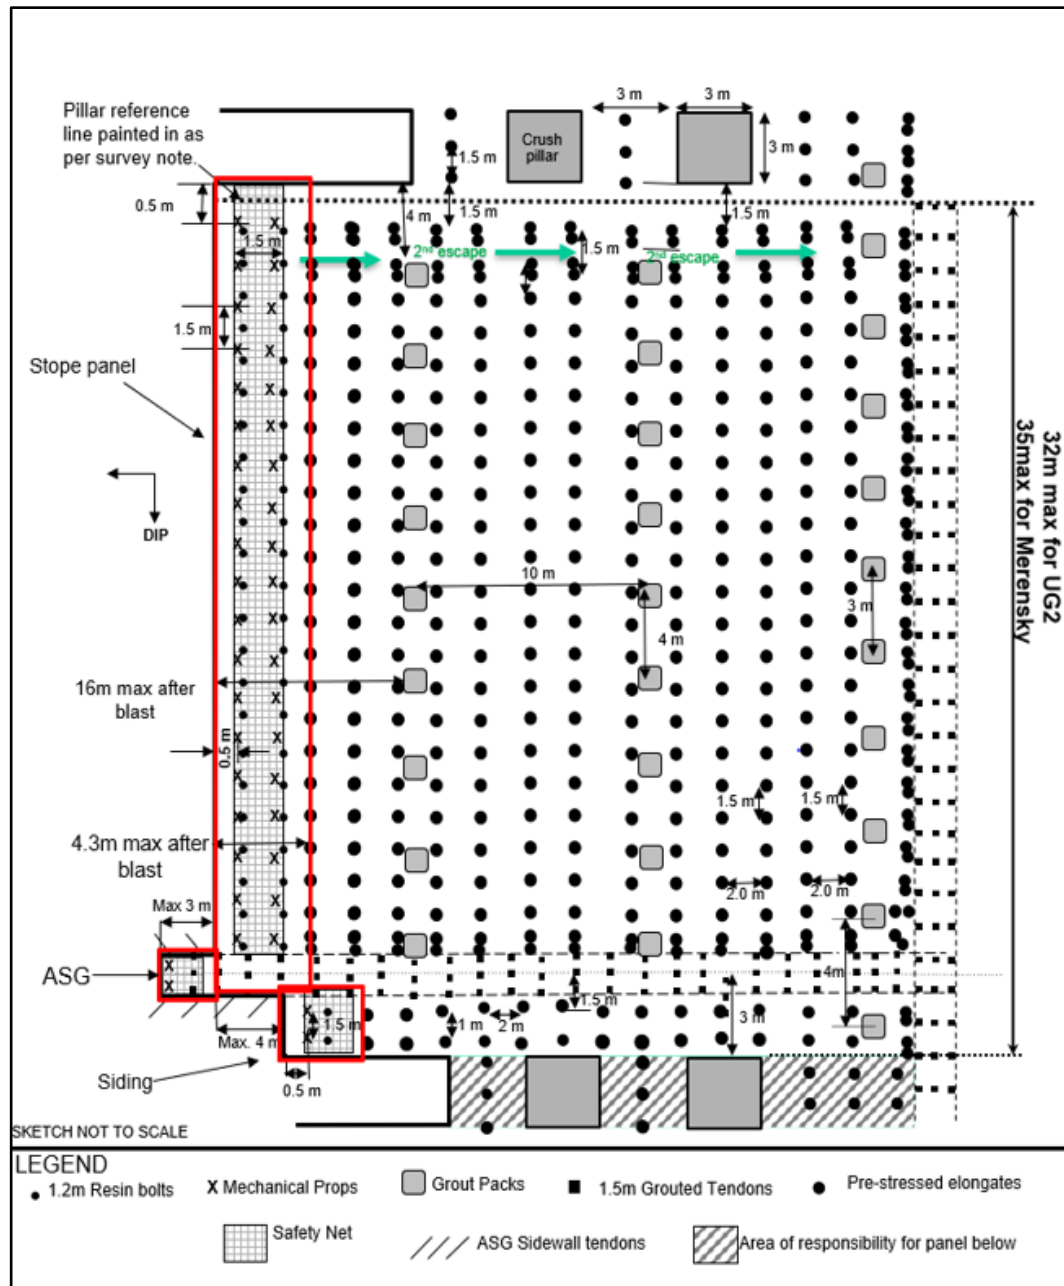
Breast stope panel support layout for Thembelani Mine
